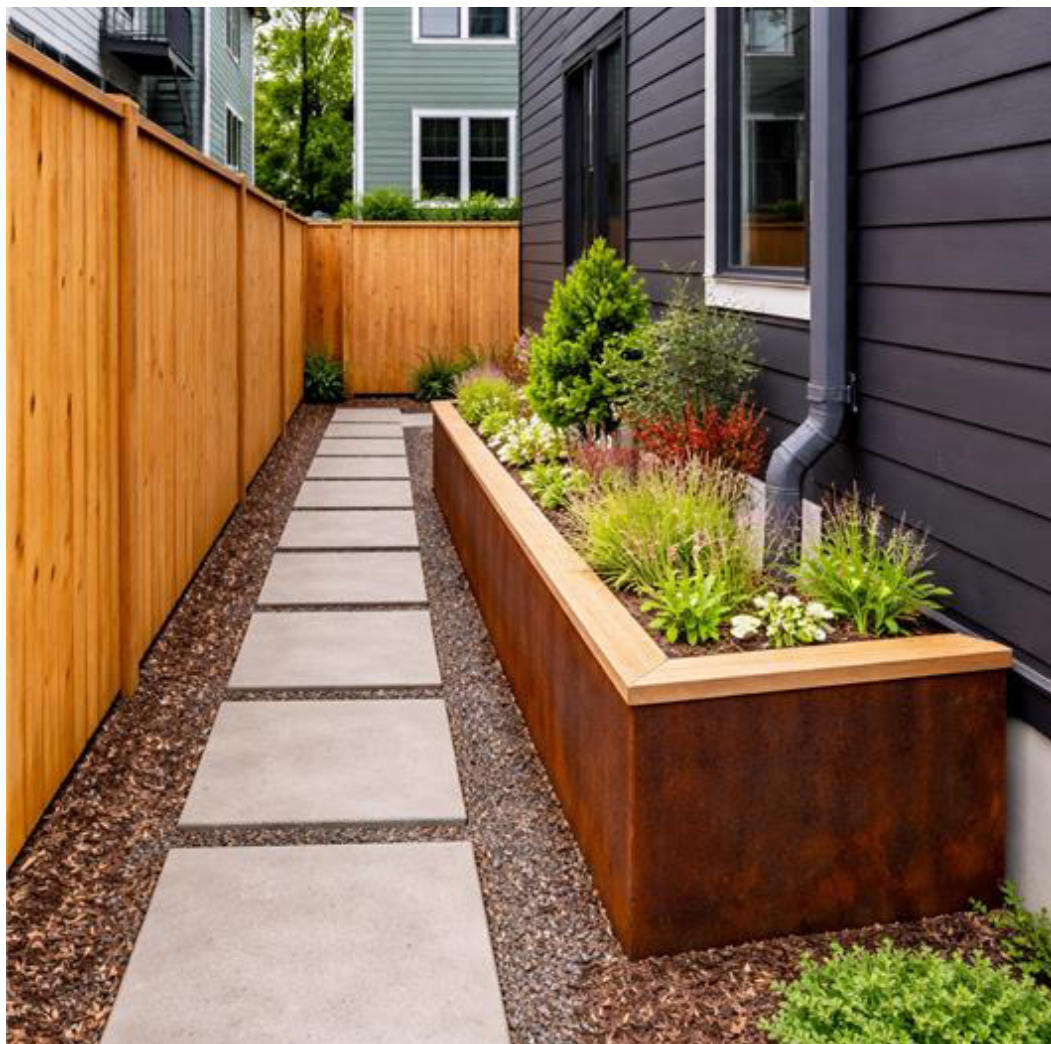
Example of Bioretention Planter with Metal Wall Material.
